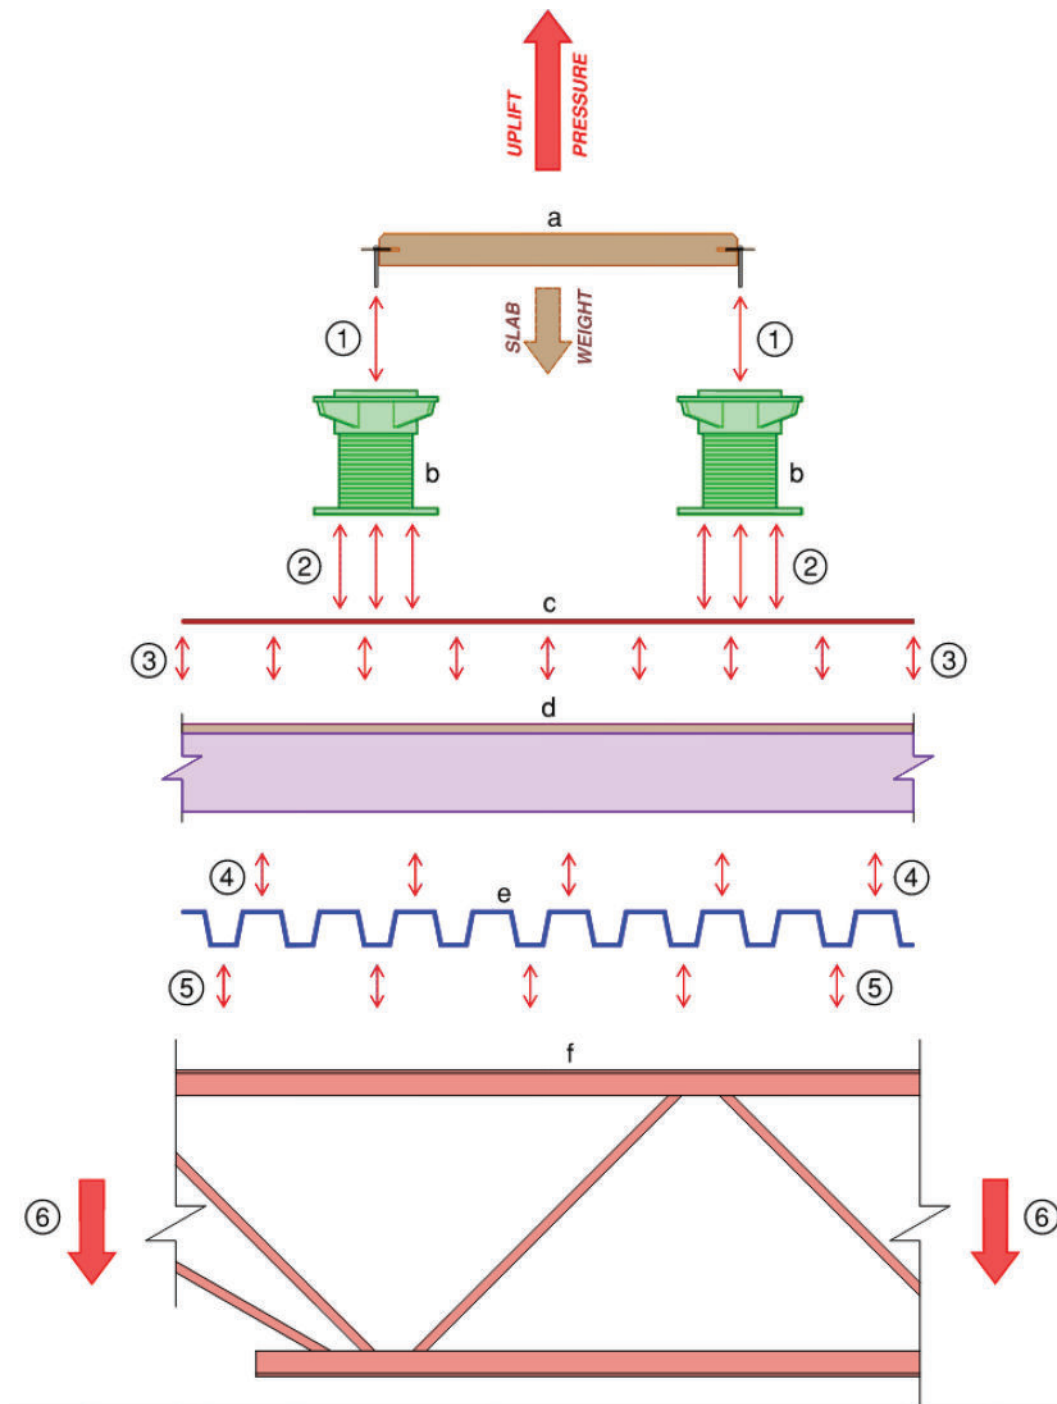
Load path for a segmental concrete paving system installed on a rooftop of a building; Note that numbers denote load path (refer to the body of the text); and, lower-case letters denote the system components: (a) concrete paving slab; (b) adjustable pedestal supports; (c) single-ply roof membrane; (d) polyisocyanurate (ISO) insulation with bonded wood layer (OSB) for screw connections; (e) steel roof deck; (f) open-web steel joist.
